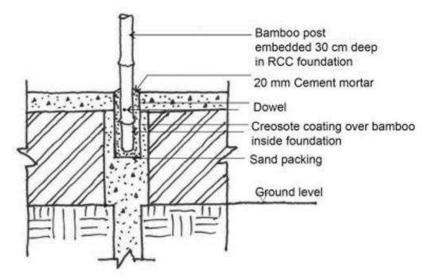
57 Concrete foundation plinth for bamboo construction.
